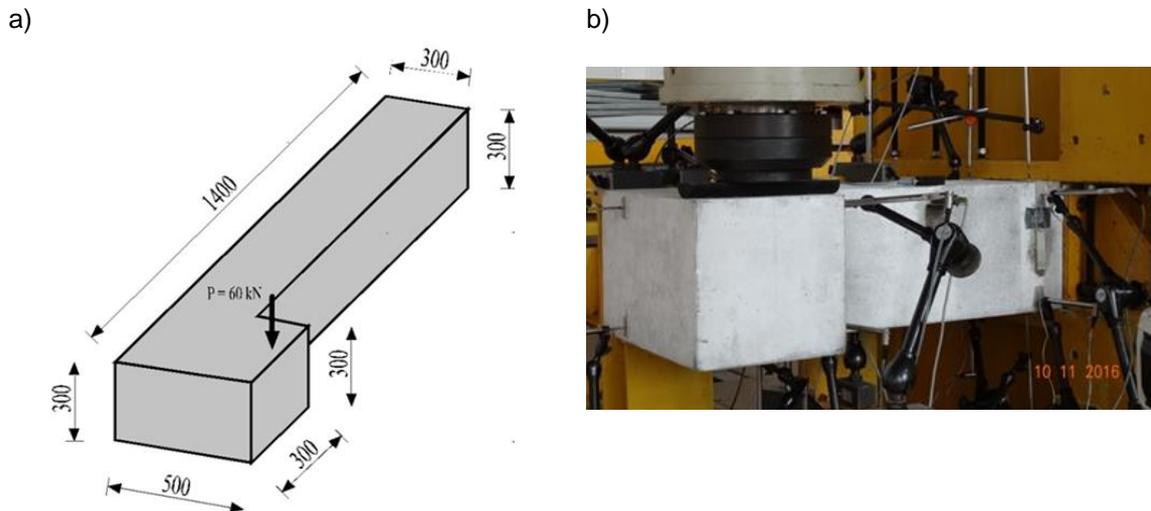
Analysed cantilever beam, a) geometry and reinforcement of tested beams, b) the view of the test stand
